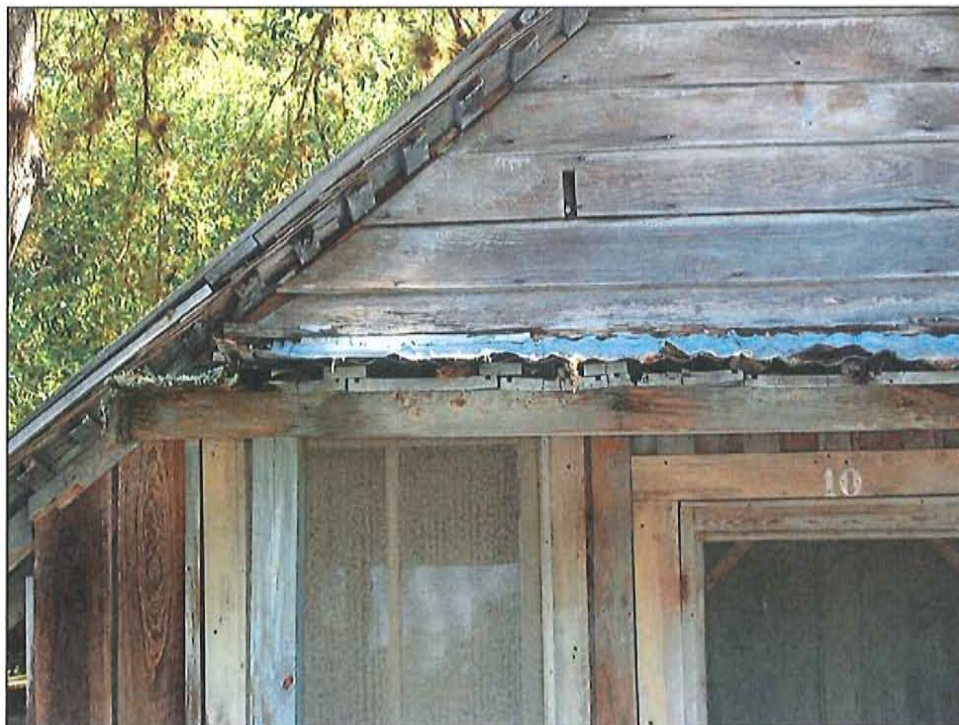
Detail of roof at south façade and front porch with layering of roofs
